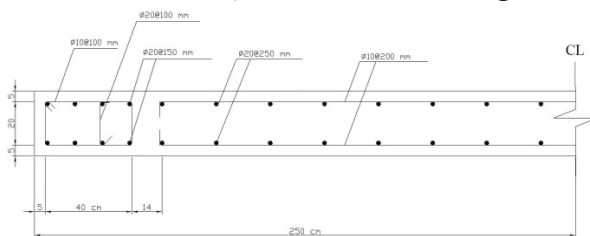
The 3-story frame's shear wall cross-section (for all Storie)
